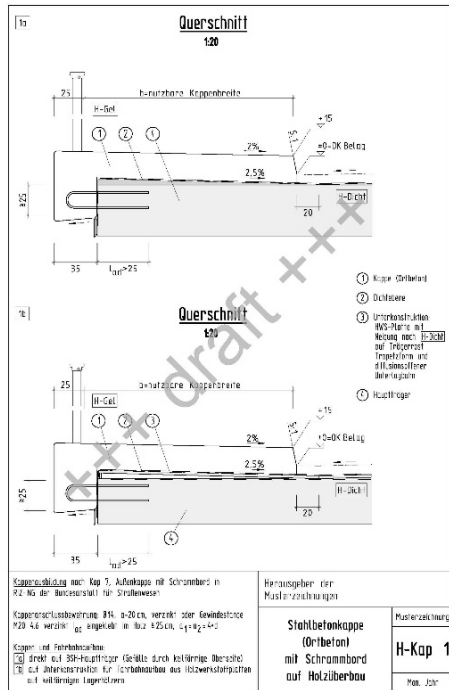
Example of an cast-in-place bridge-cap for timber bridges (draft)
